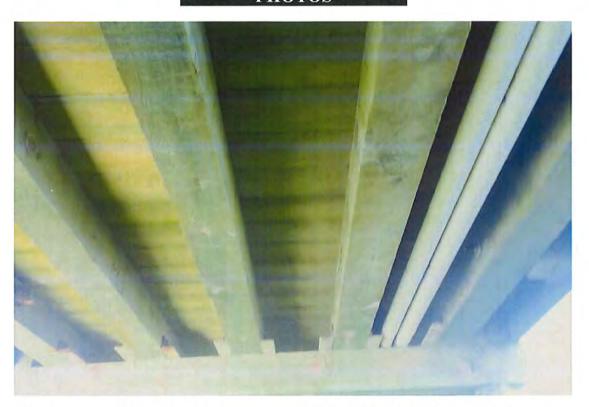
General underside Span 5 looking west, minor mildew staining throughout soffit.
